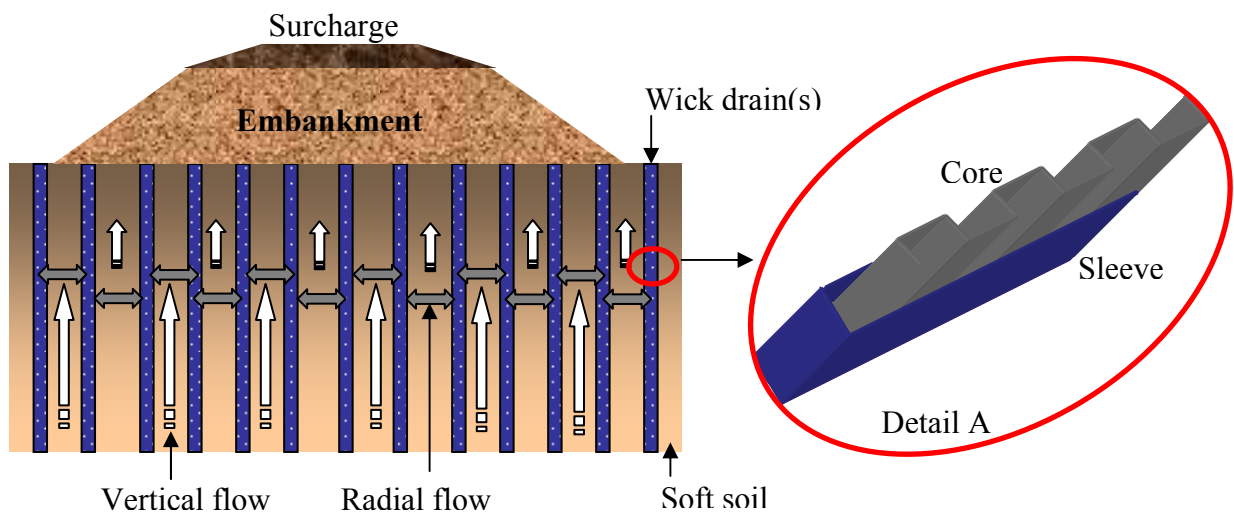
Preloading with Prefabricated Vertical Drains to Reduce Consolidation Settlements
